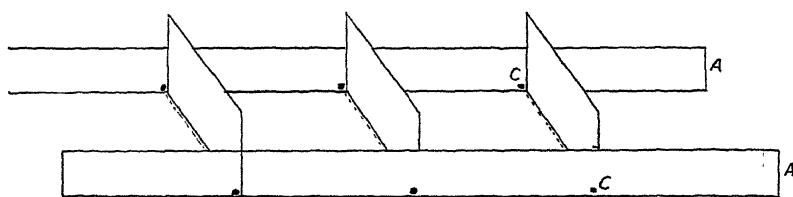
SHOWING METHOD OF ASSEMBLING THE NEST PARTITIONS (CROSS BOLTS ONLY).
